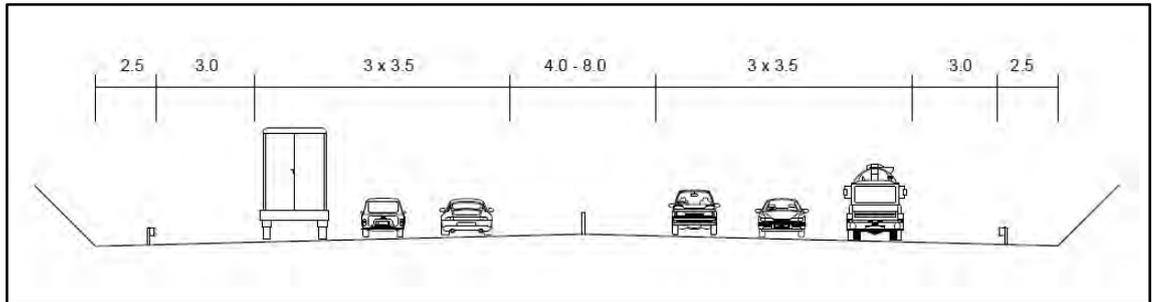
Typical Cross Section of 6 Laning SH1 Full Shoulders & Existing Median
